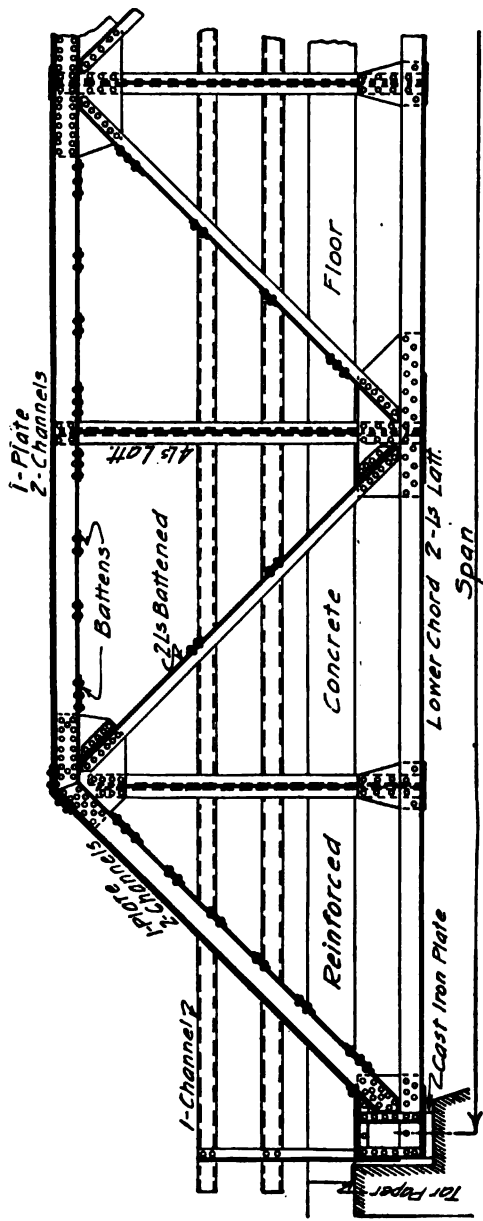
Riveted Pony Truss Bridge. Iowa State Highway Commission.
